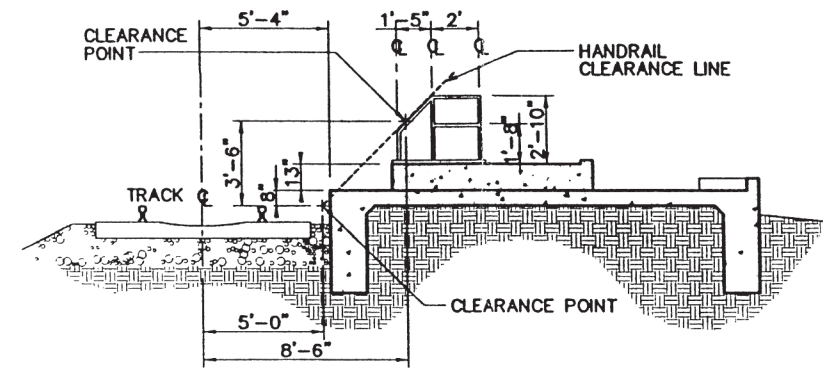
Sample Sounder Station Plan - Sections, Single and Double Side Platforms
